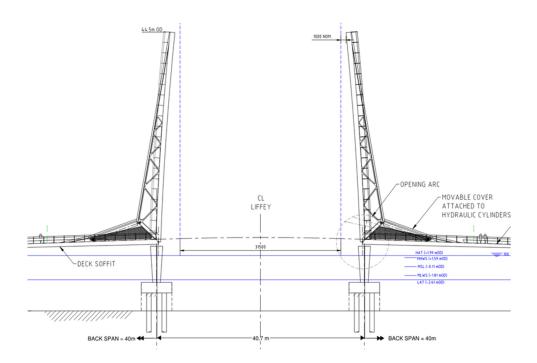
Span arrangement (40m - 40.7m - 40m) providing a 31.5m wide navigation envelope with unlimited headroom
